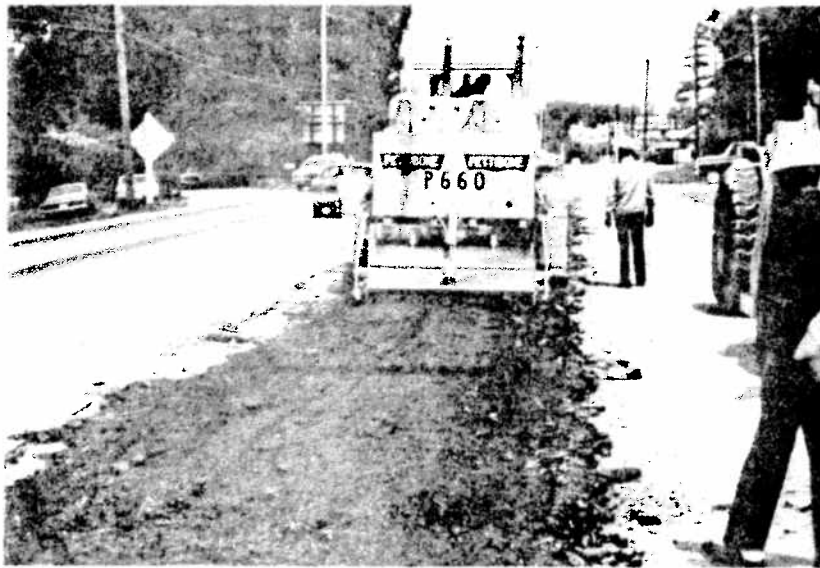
Road mix material in passing lane at same elevation as traffic lane.
